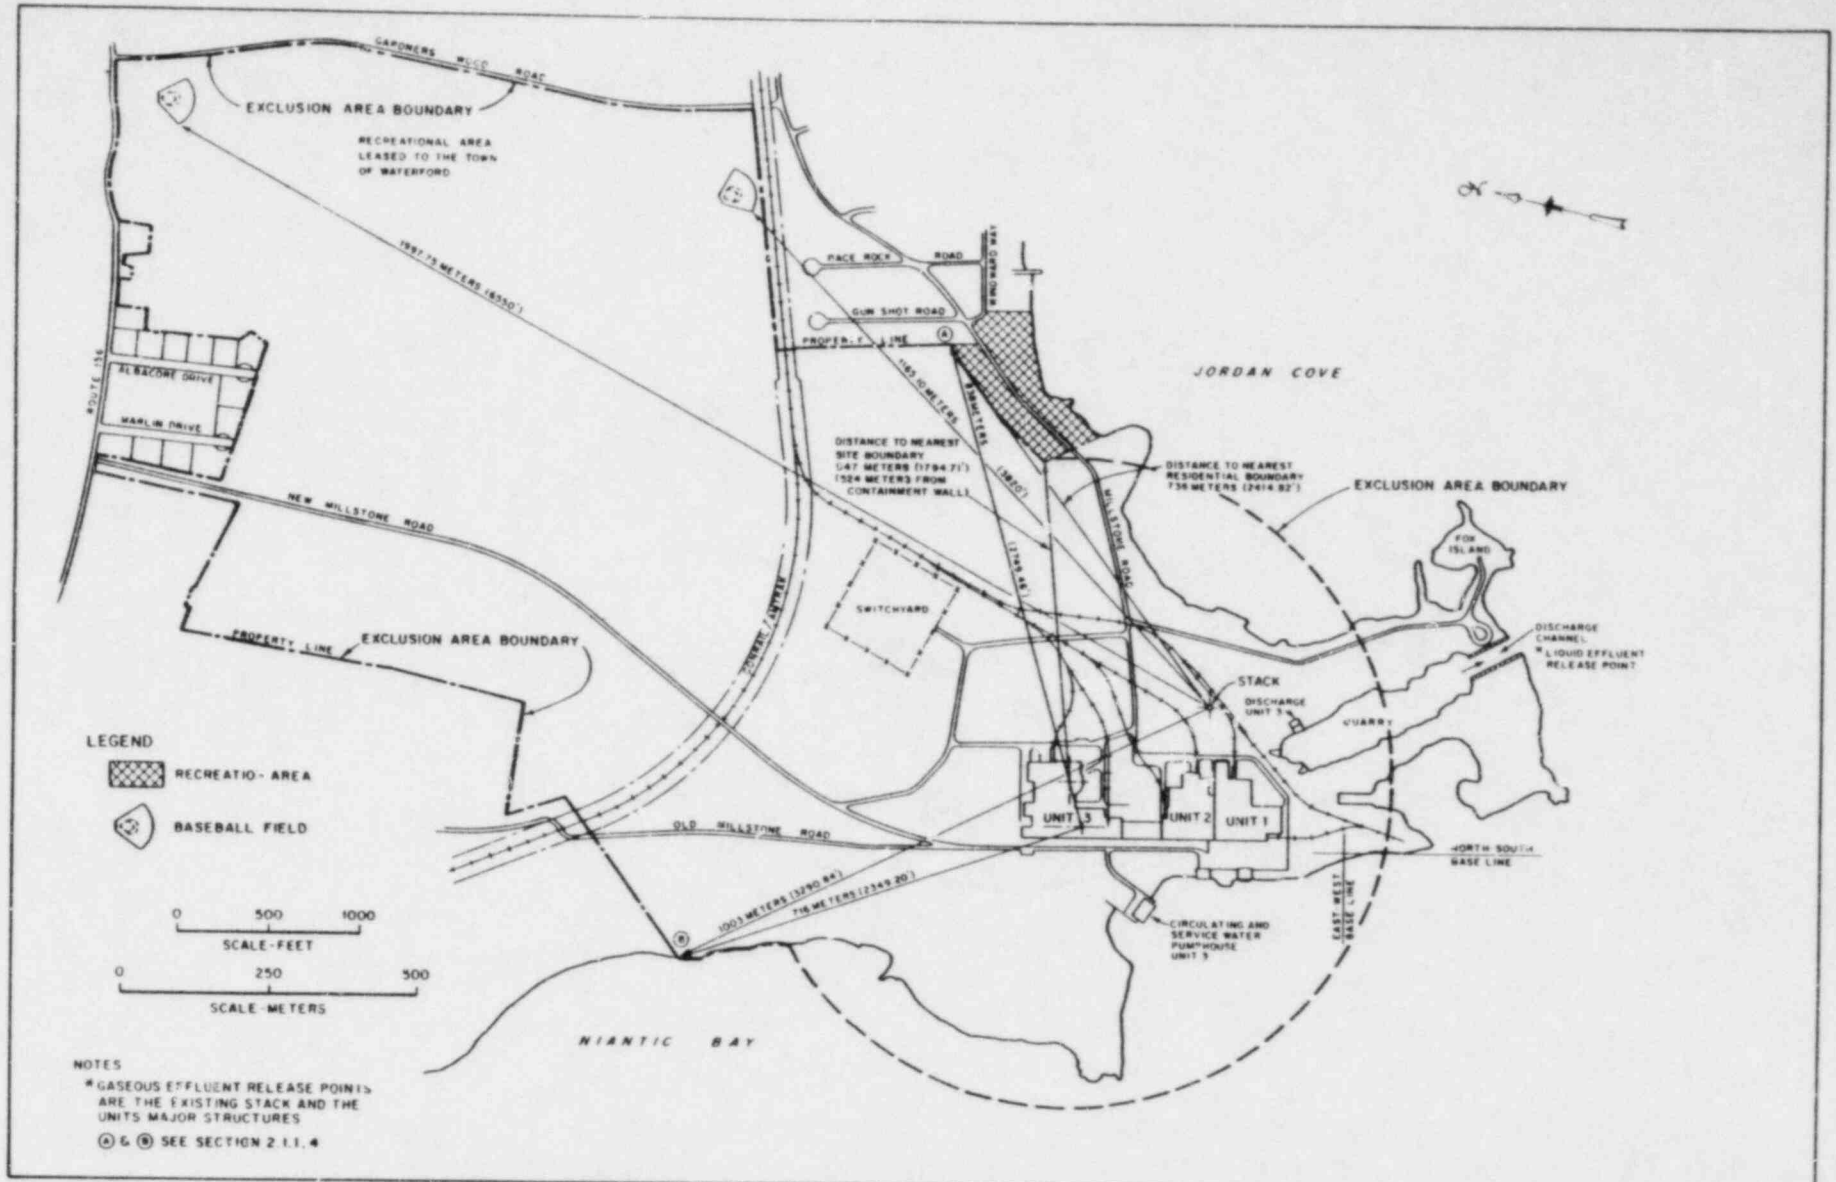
Site layout--Millstone Nuclear Power Station Unit 3
